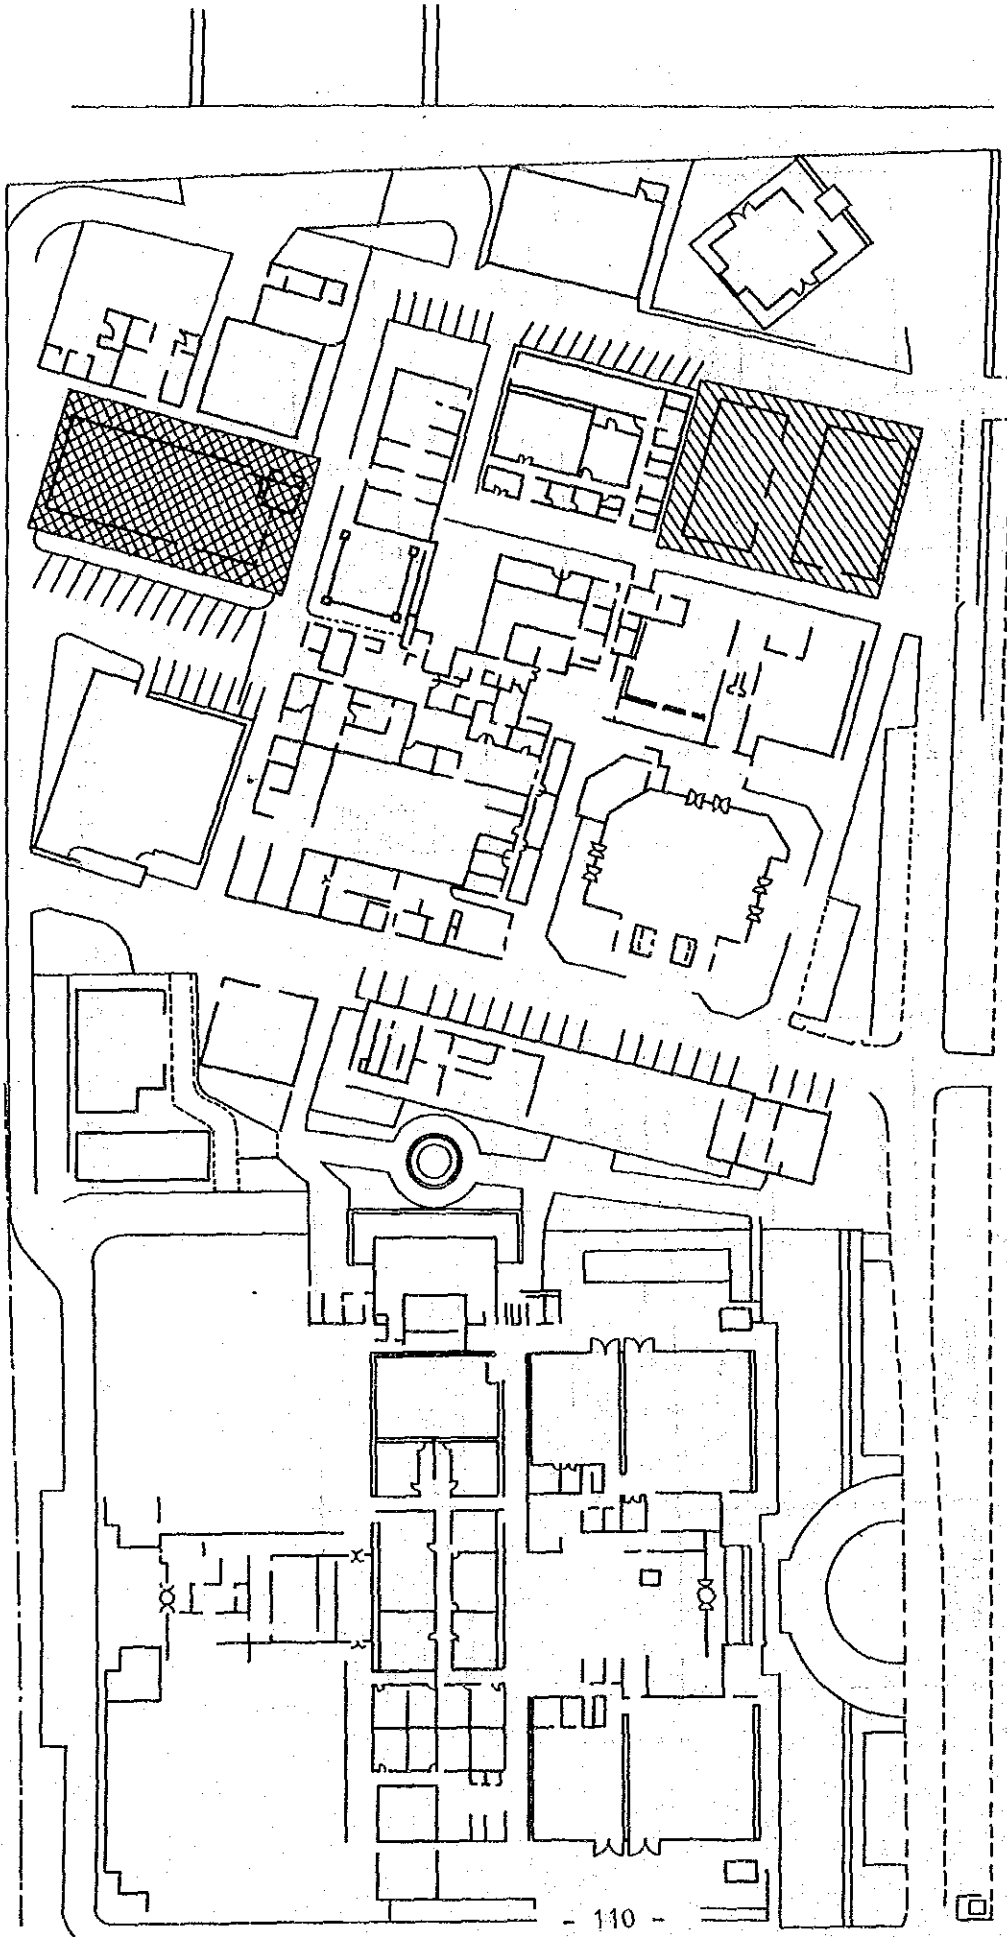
The Floor Layout of EC Headquarters (RRI RADIO DALAM) 500
